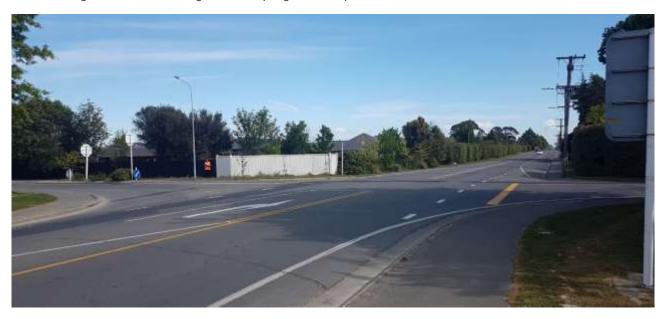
Intersection of Trents Road and Springs Road (Looking south-west down Springs Road).
